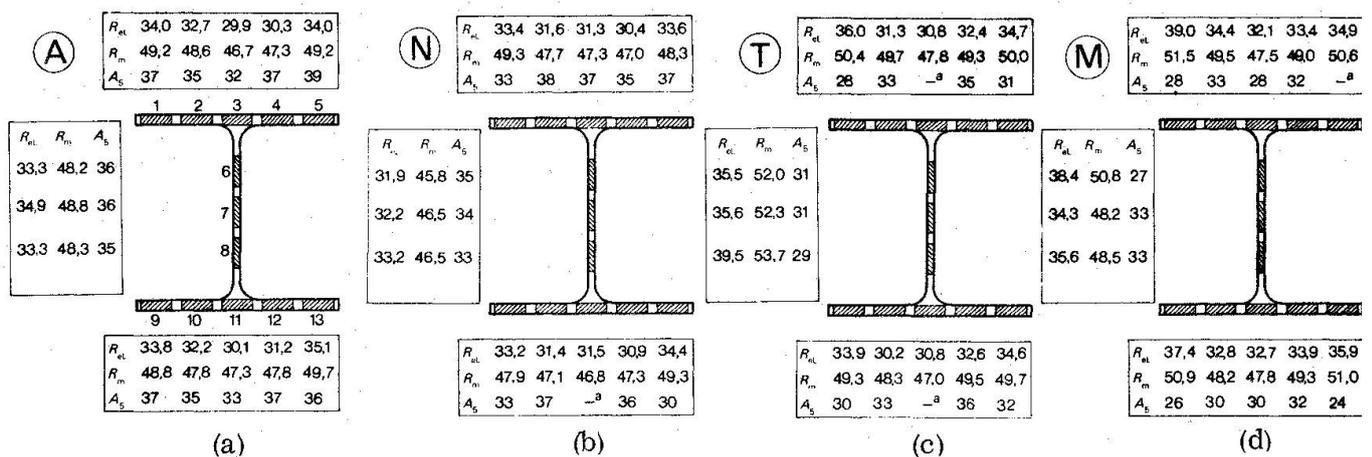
Results of 52 tensile-specimen tests on HE 200 A shapes being (a) as-rolled and subjected to (b) normal rotorizing, (c) twice rotorizing, and (d) modified rotorizing. The symbol "a" denotes fracture outside gage length.
